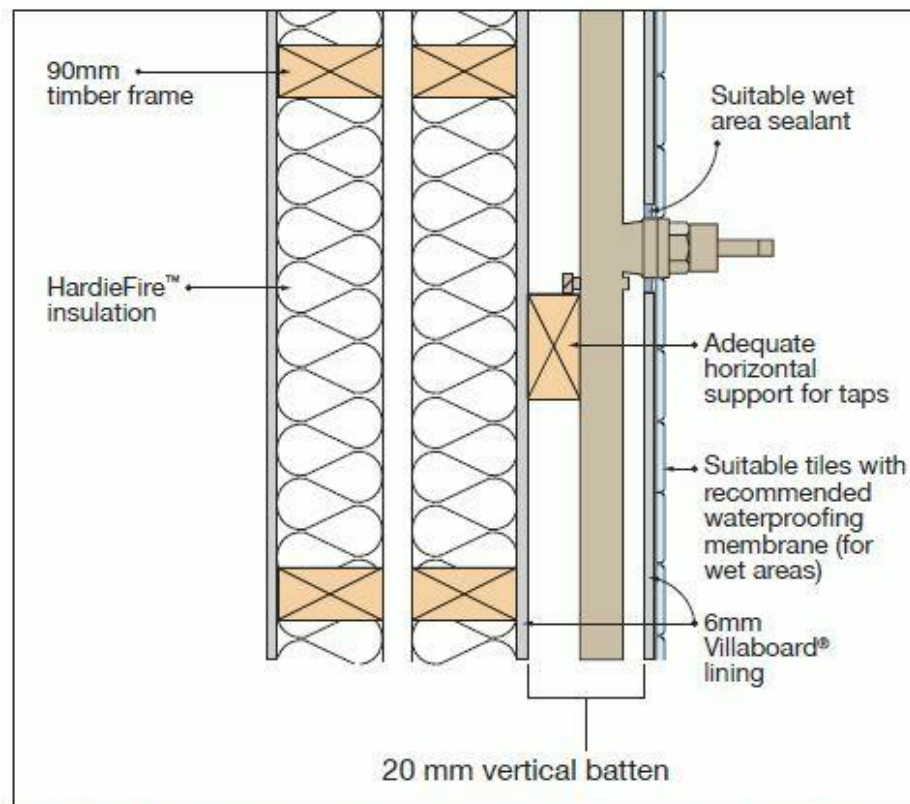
HARDIESMART™ INTERTENCY WALL SYSTEM PLUMBING PIPE PENETRATION - SECTION
